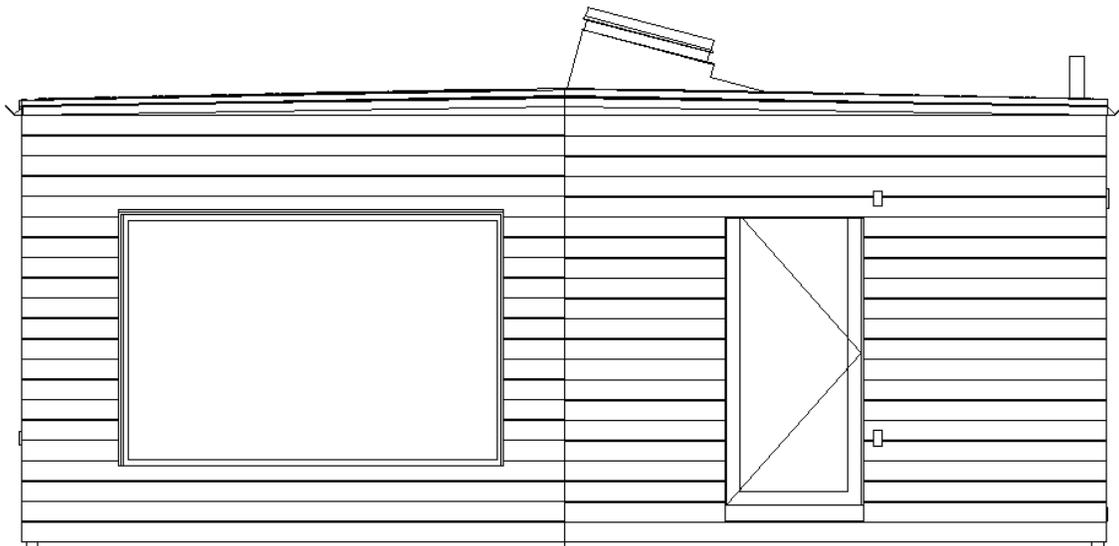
South Elevation: Original $\Delta T90$ House⁷
